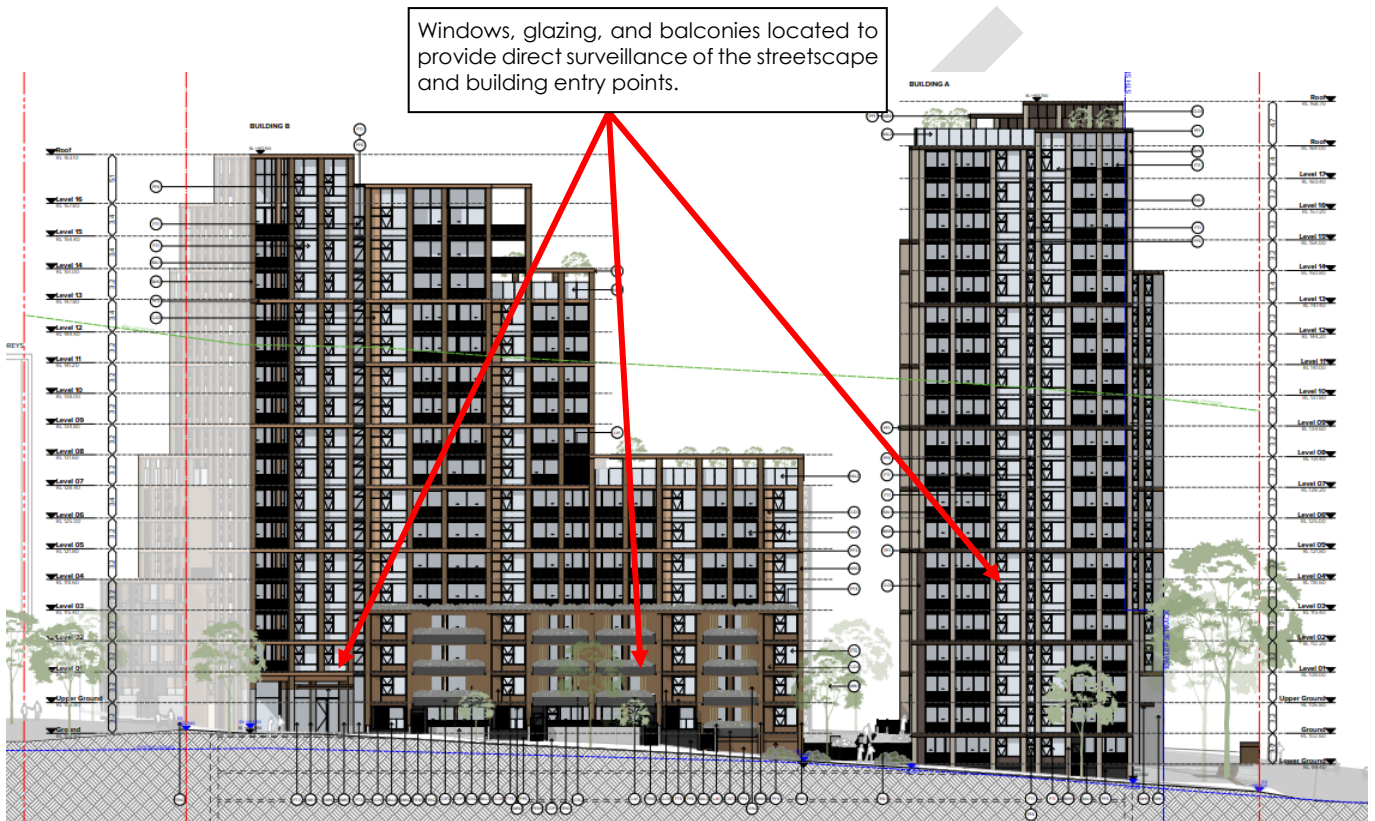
Extract of elevation plan for Carrington Road (Turner Studio, 2025)
